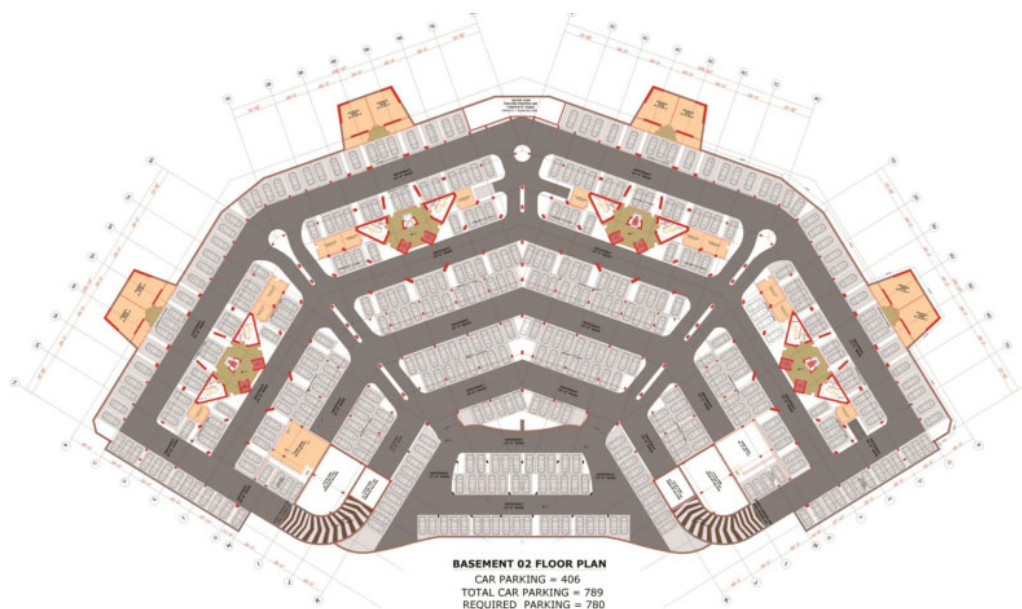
BASEMENT 02 FLOOR PLAN
